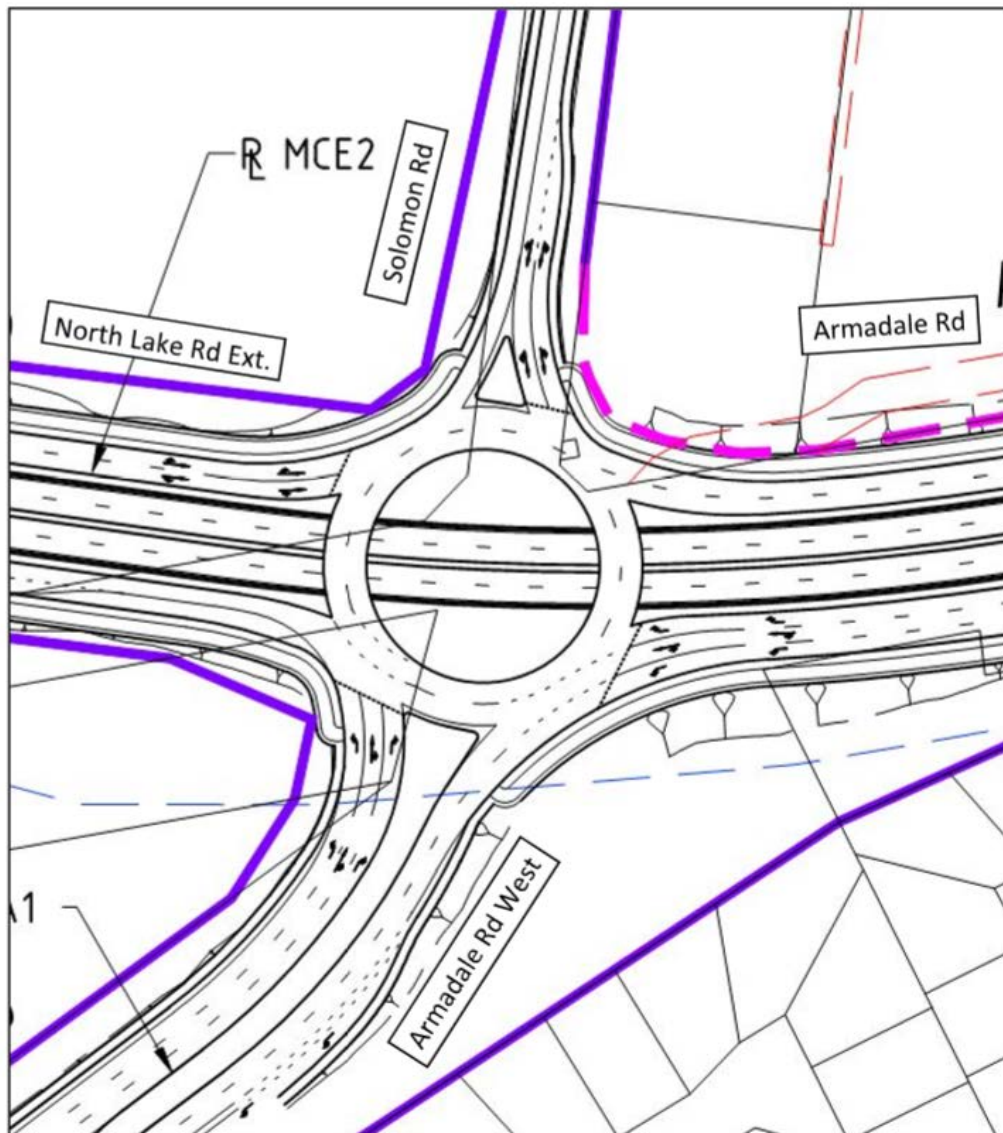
North Lake Road/Armadale Road/Solomon Road Intersection Layout
